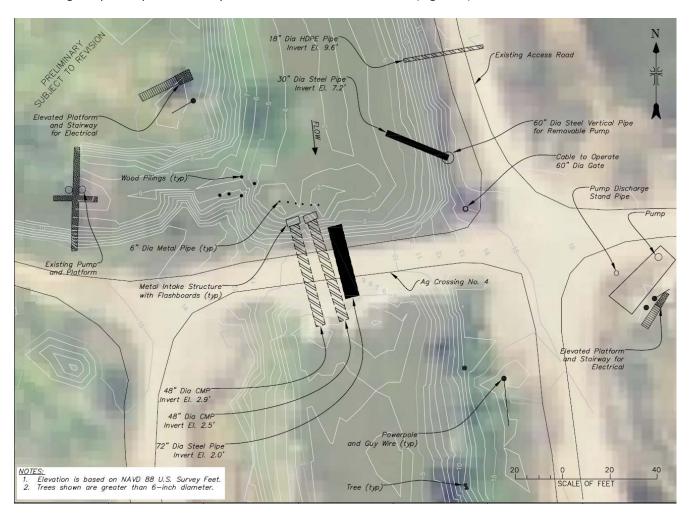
Agricultural Road Crossing 4 Existing Facilities- Plan View
